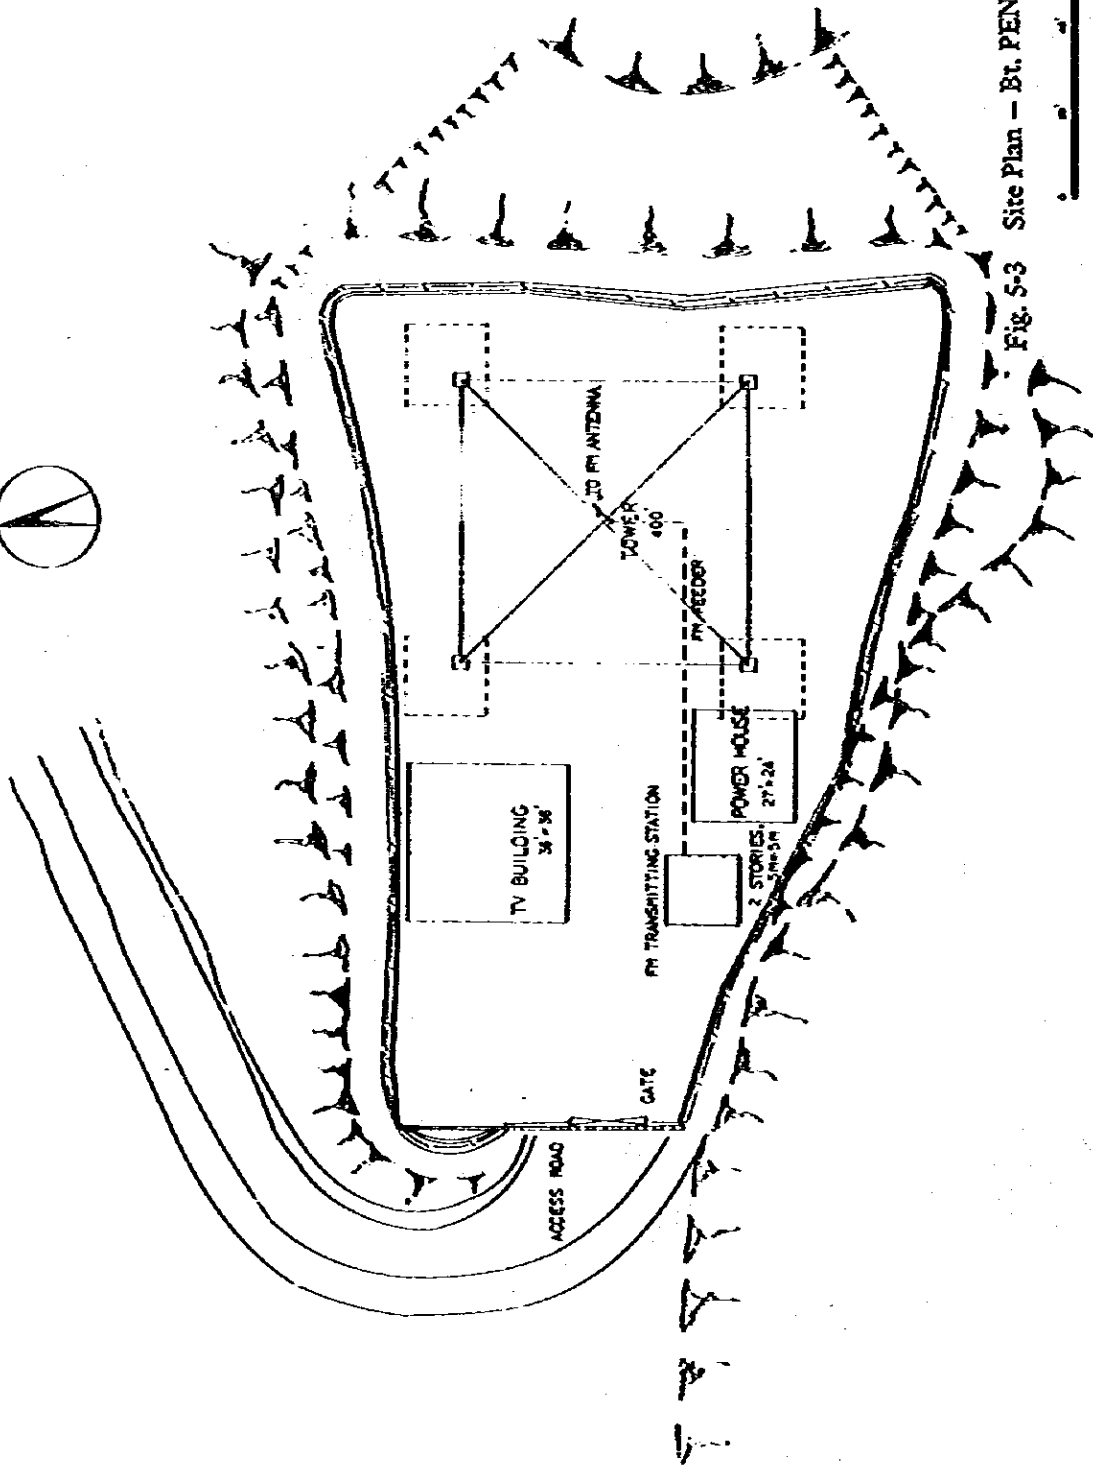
Site Plan - Bt. PENARA Pinang
